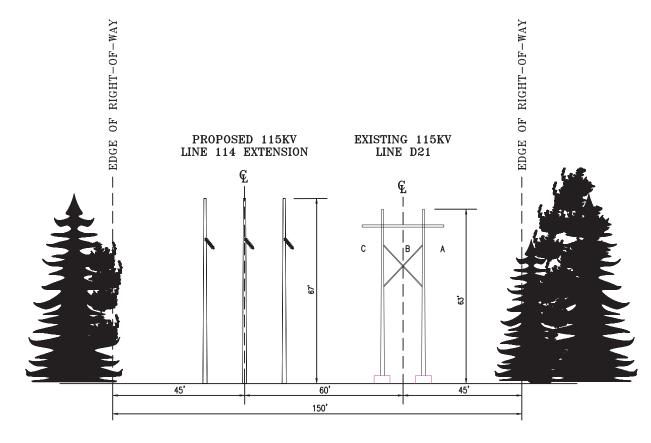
Typical ROW Cross-Sections / Plan & Profile Drawings
